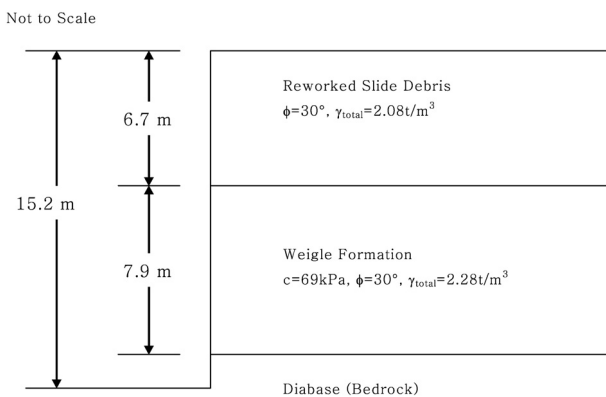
Soil Profile for the Bonneville Navigation Lock
